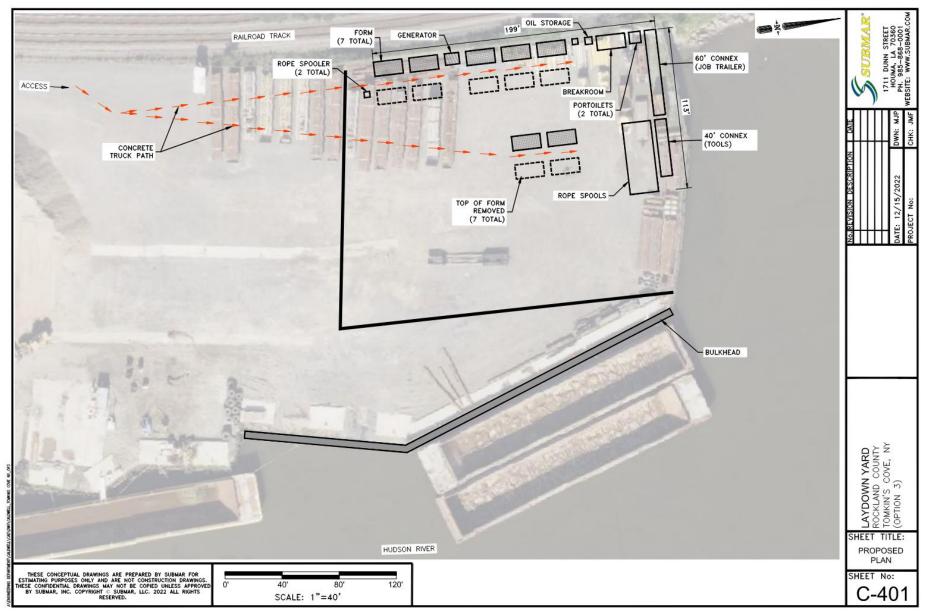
Tomkins Cove Mattress – Site Boundary Plan
